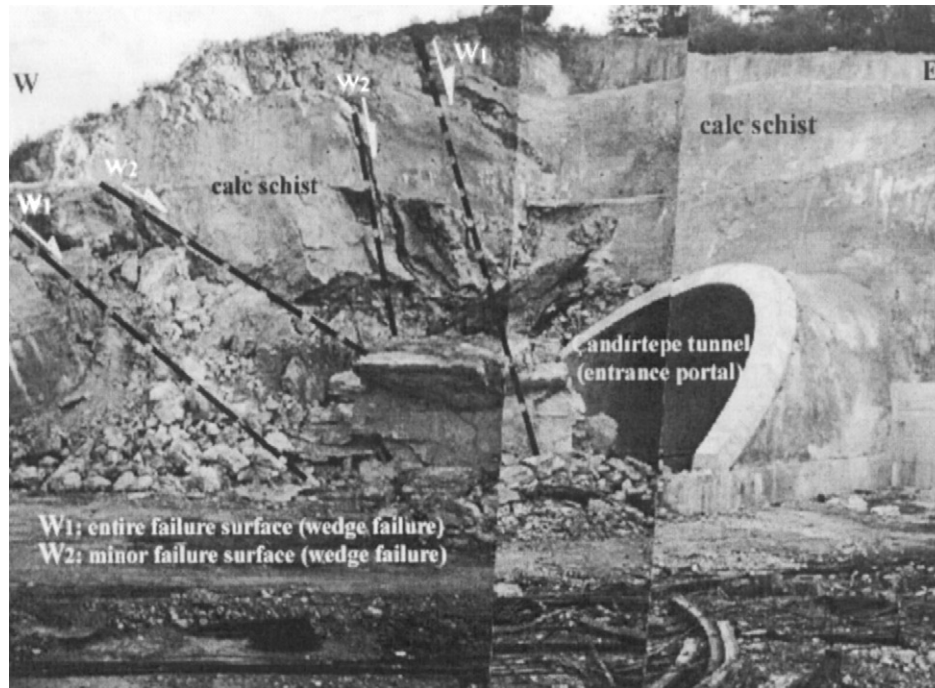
General view of the failure surfaces (wedge failures) towards the west cut slope of the entrance portal of the Çandırtepe tunnel.
